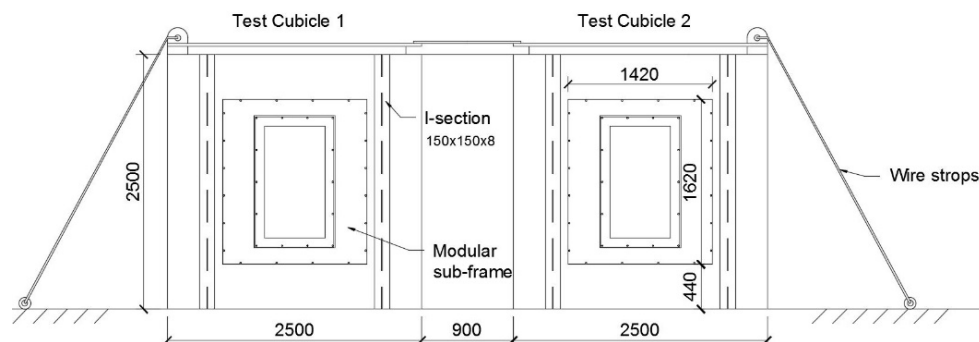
Front elevation (drawing) of test cubicles. View towards ABT RWE.
